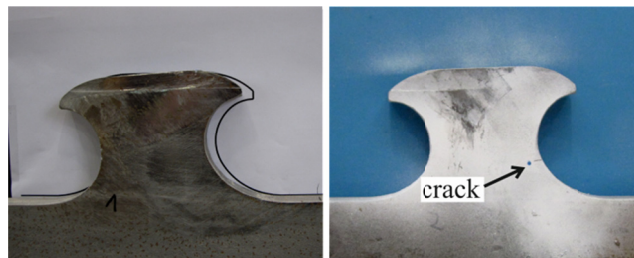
Test specimen with steel failure: plastic deformation (left) and static crack (right).
